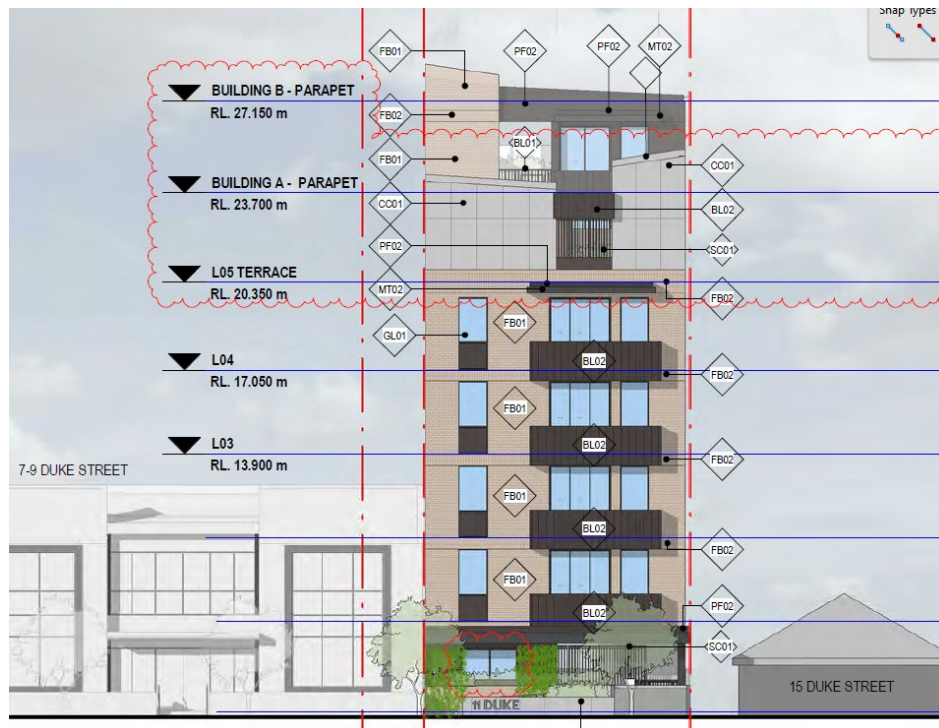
Duke Street Elevation depicting gradual setback of the building as it increases in height.
